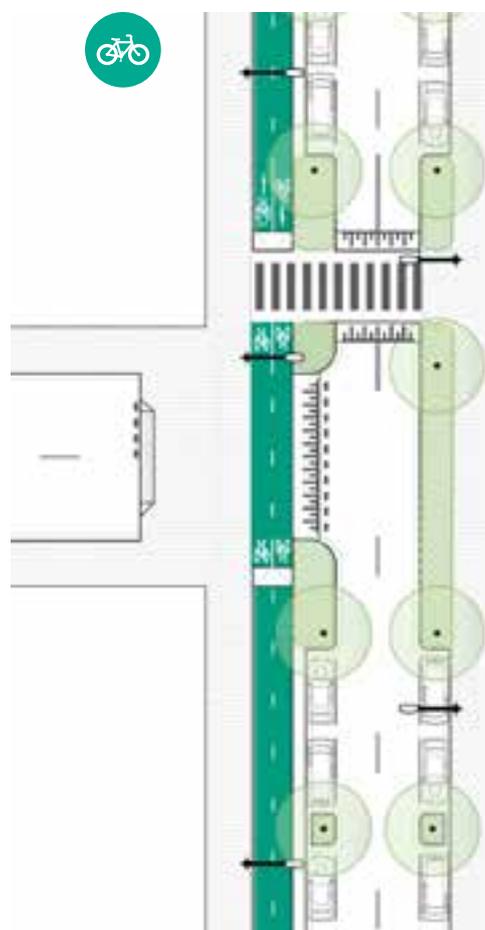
Bicycle path (two-way), continuous cycleway raised intersection - plan
